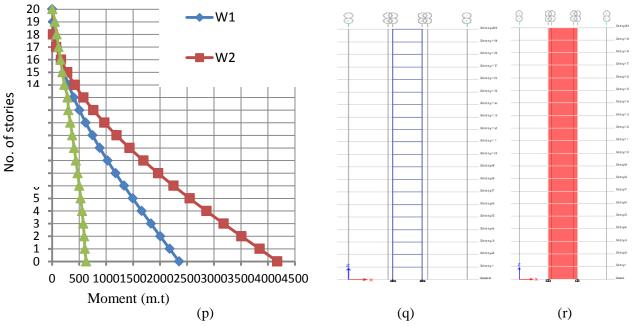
(p) Represents the comparison of bending moment results between W1, W2 and W3-(q) Elevation of W3 shear wall modified to frame system at 20<sup>th</sup> floor- (r) Elevation of shear wall W1 for model 1 and W2 for model (1-f).
